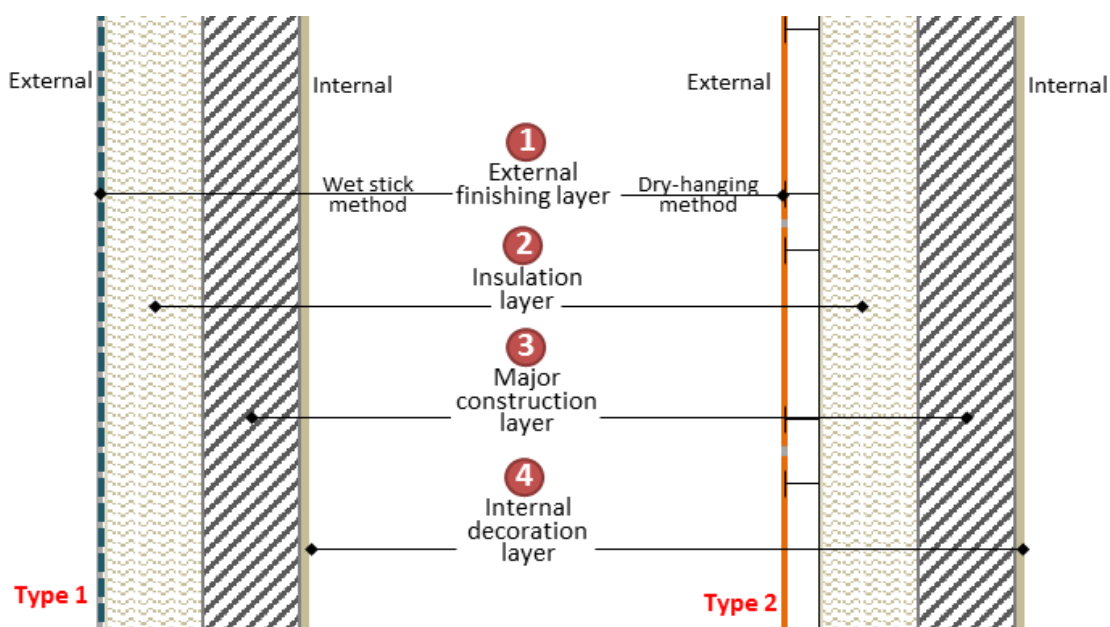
Schematic drawing of the 4-layer external wall structure
